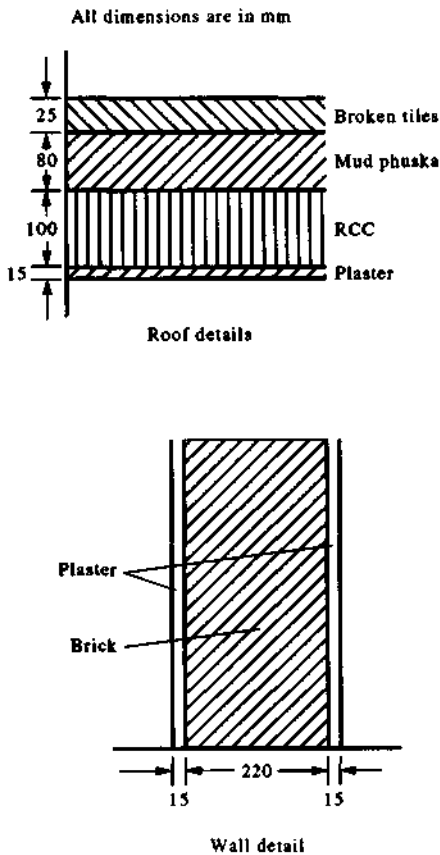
Wall and roof details considered for a heavy construction single zone building.
